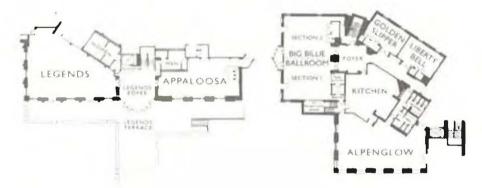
THE PEAKS CONFERENCE FACILITY FLOOR PLANS
